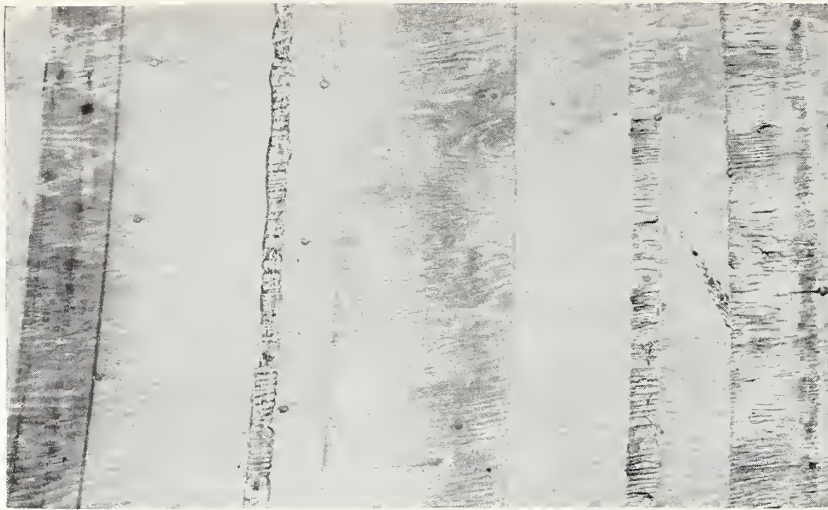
$\frac{1}{2}$ -in. Douglas-fir plywood on strip-wood subfloor (test panel 19L).
